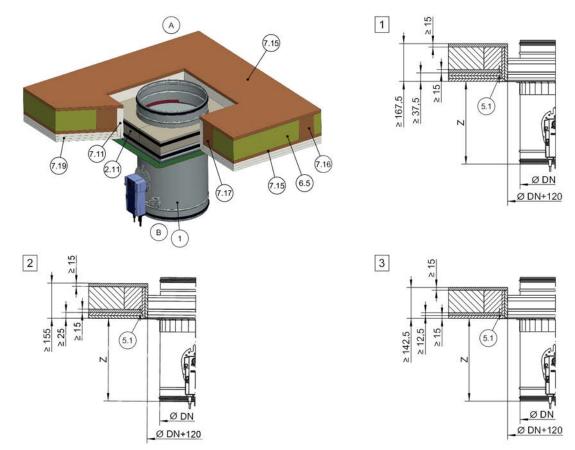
Dry mortarless installation with installation kit TQ into wooden beam / laminated beam ceiling, upright (illustration representative, alternative ceiling construction possible on request)
